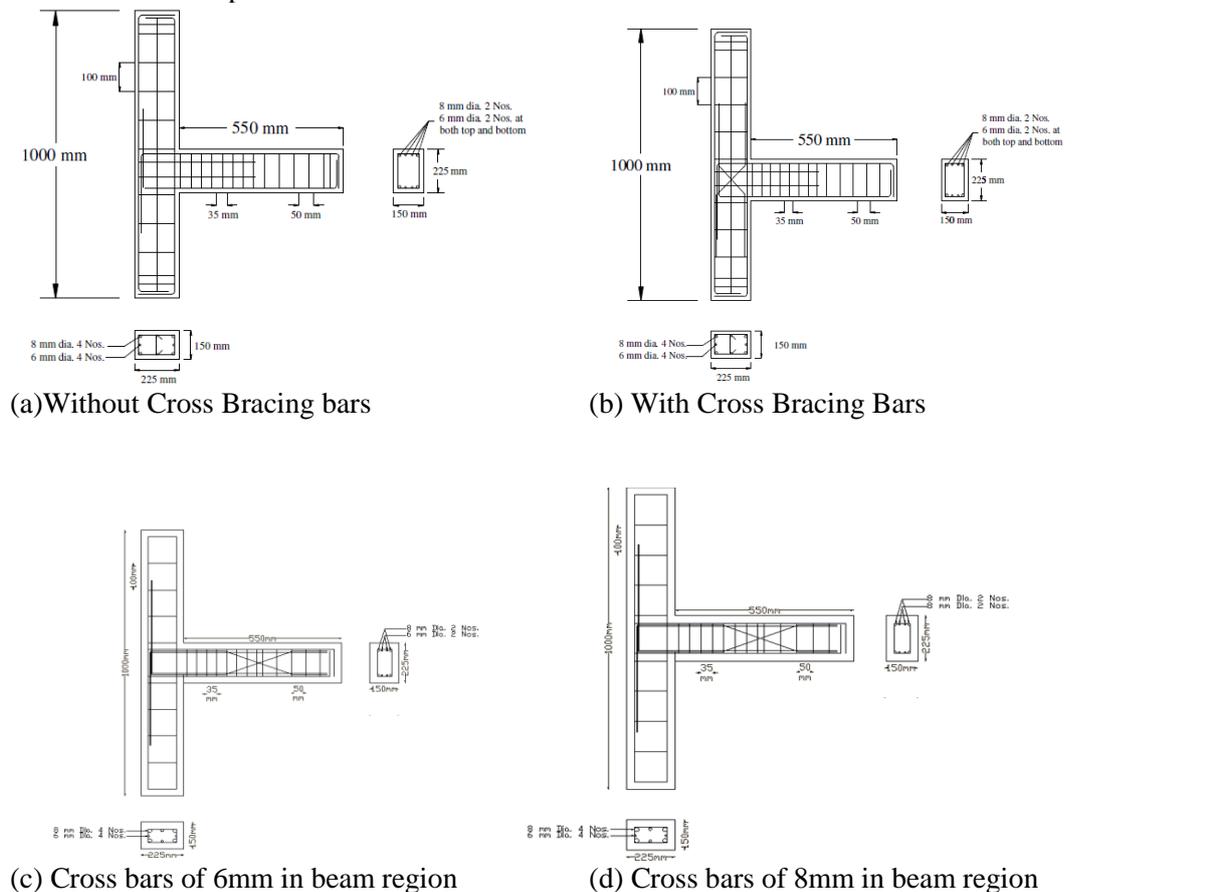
Reinforcement details of specimen of (a) Without Cross Bracing bars and (b) With Cross Bracing Bars. (c) Cross bars of 6mm in beam region. (d) Cross bars of 8mm instead of 6mm in beam region.
